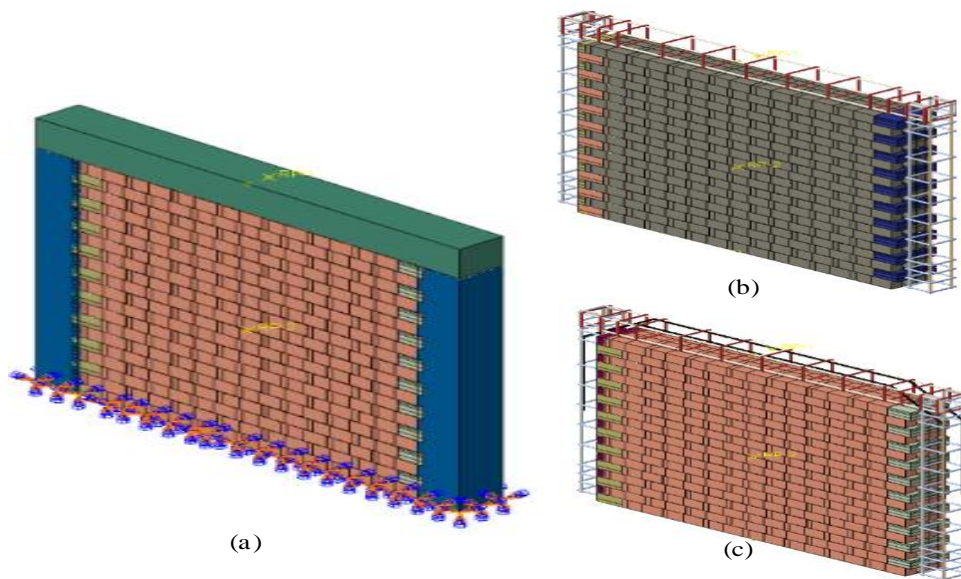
Details of FEM of Interlocking Hydro Form Dry Brick Masonry Wall (a) Model geometry with constraints (b) IHDBMW-1 (c) IHDBMW-2
